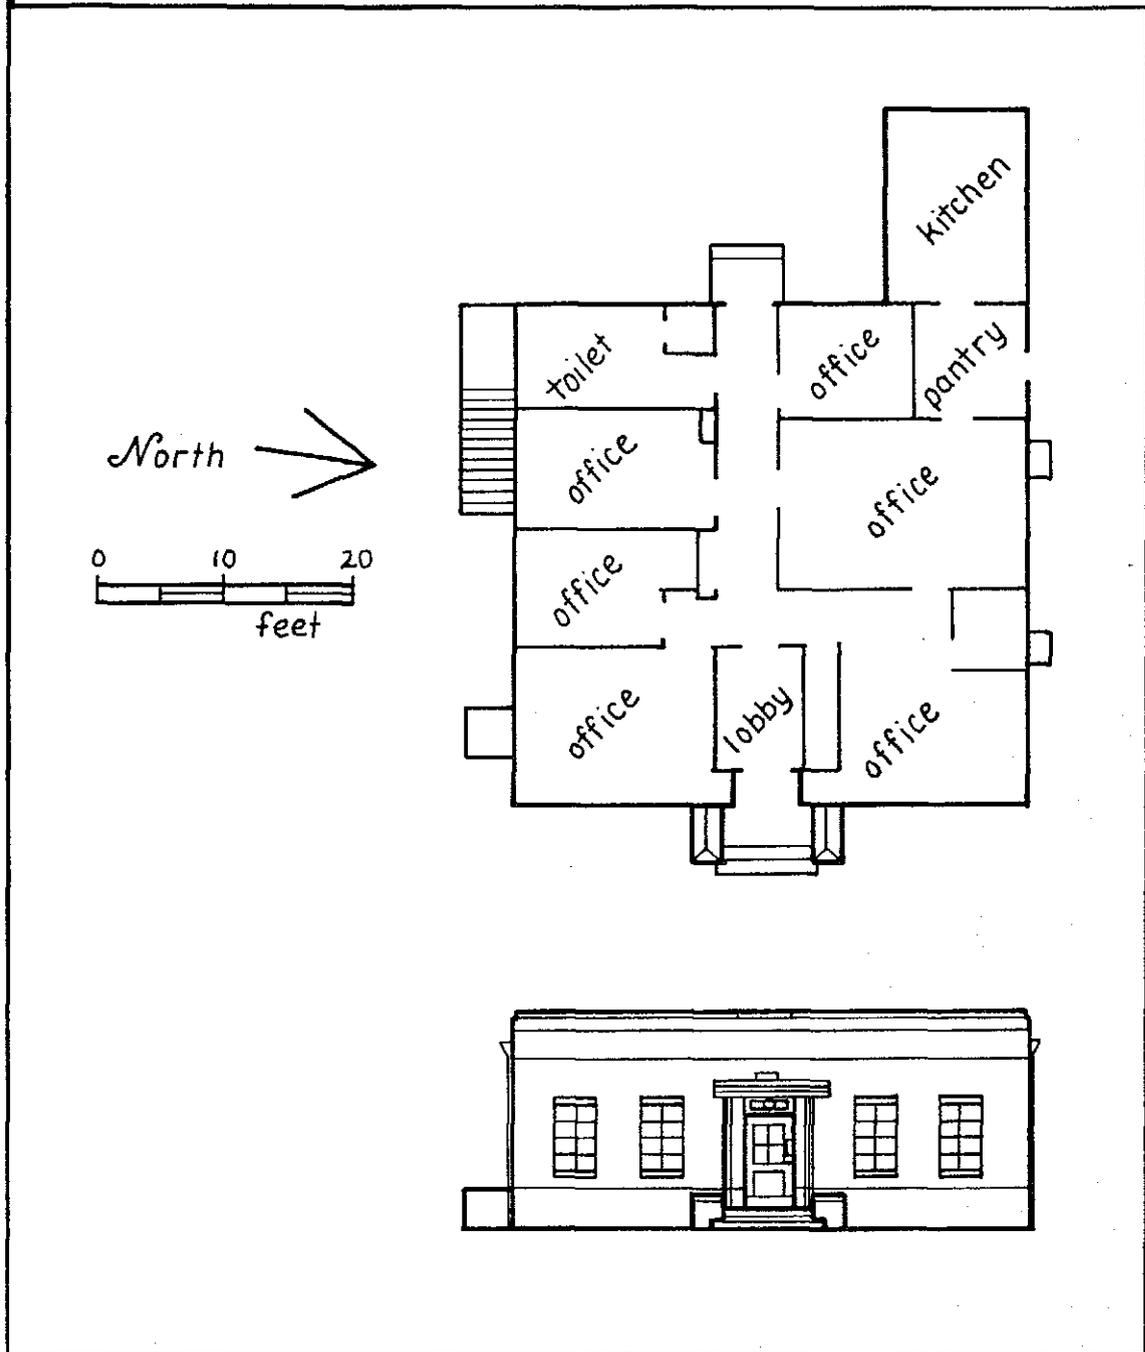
Floor plan and front (east) elevation of the former Sheriff's Substation. (From: Architectural Resources Group 1988.)
